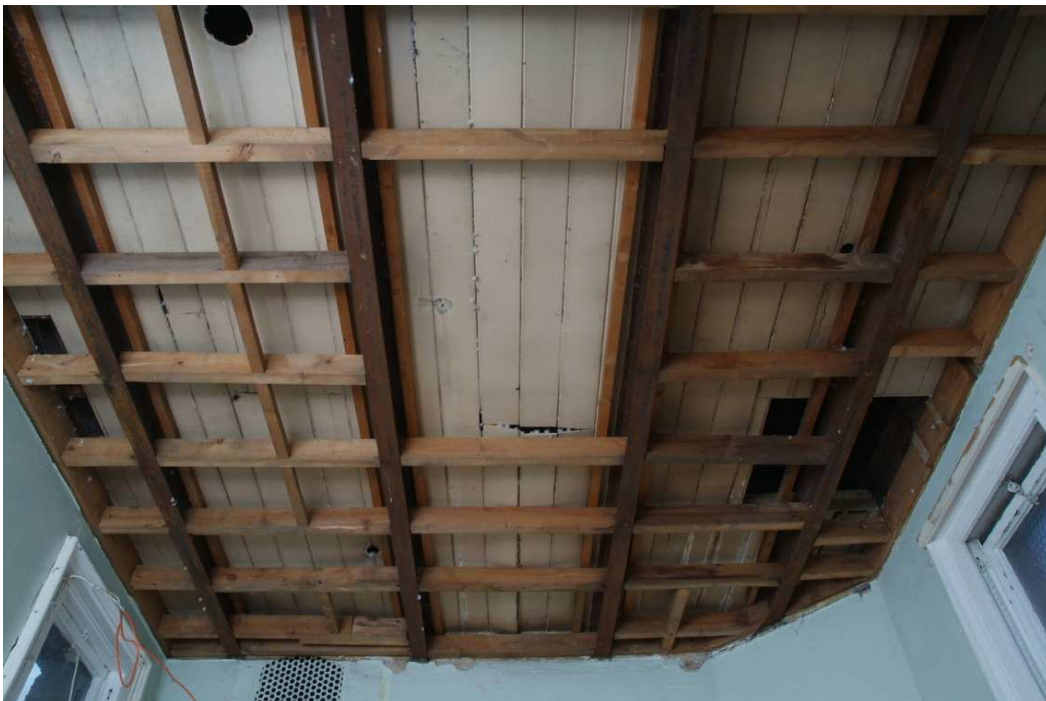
Building 24 (SF): ceiling of northwest closet wing showing inserted steel joists, view to the west
